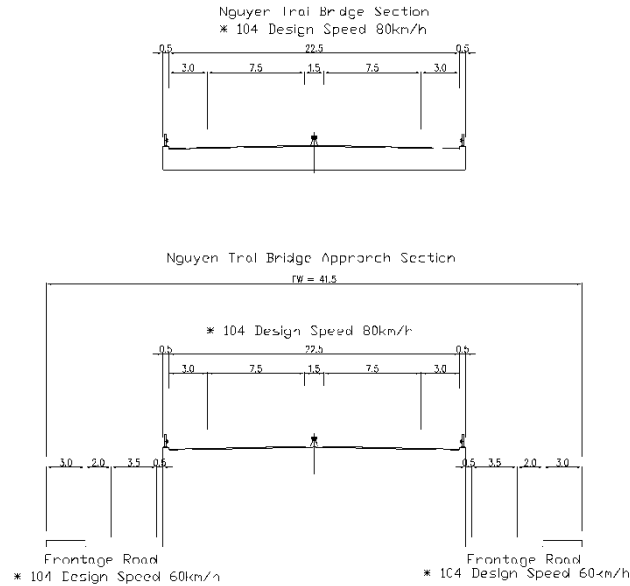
Road Width Configuration of Nguyen Trai Bridge
